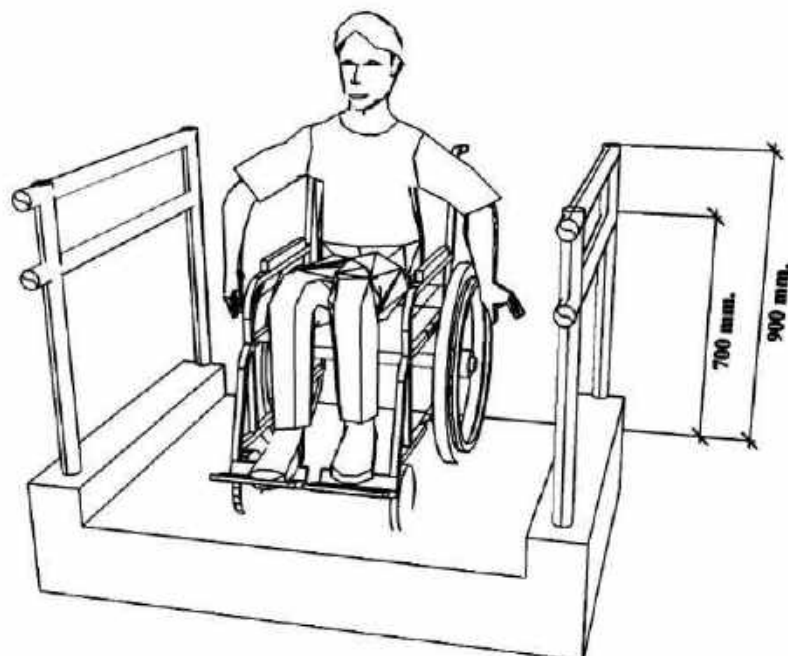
Image above shows a partial 3D view of an accessible ramp with handrails on both sides
